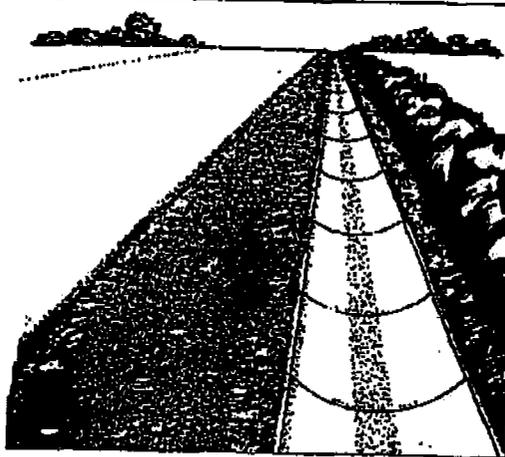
Ditch lined with reinforced concrete pipe rounds.
